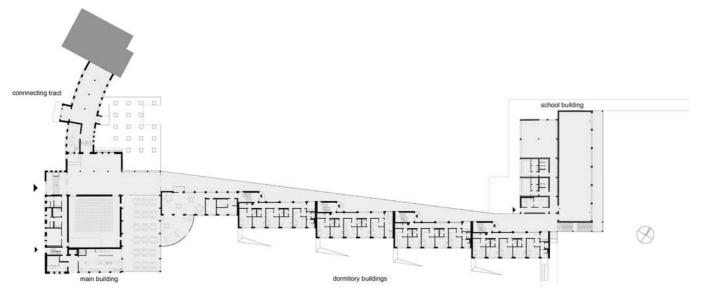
Groundplan, ground floor of the school building in current condition 2015, plan 2015, Brenne Architekten
